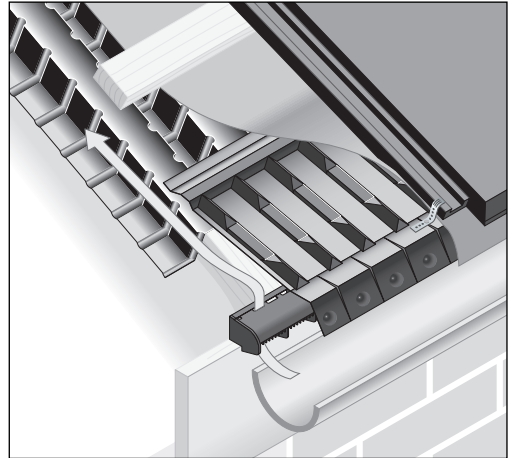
Typical eaves detail with over fascia vent strip, felt support tray and eaves clip
